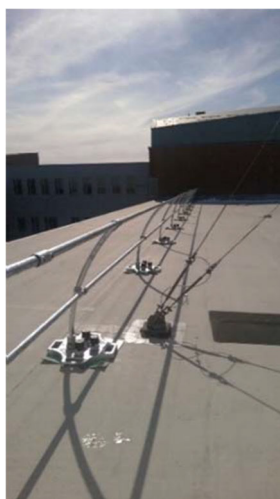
Guardrails installed on the roof of Kingsbury Hall
